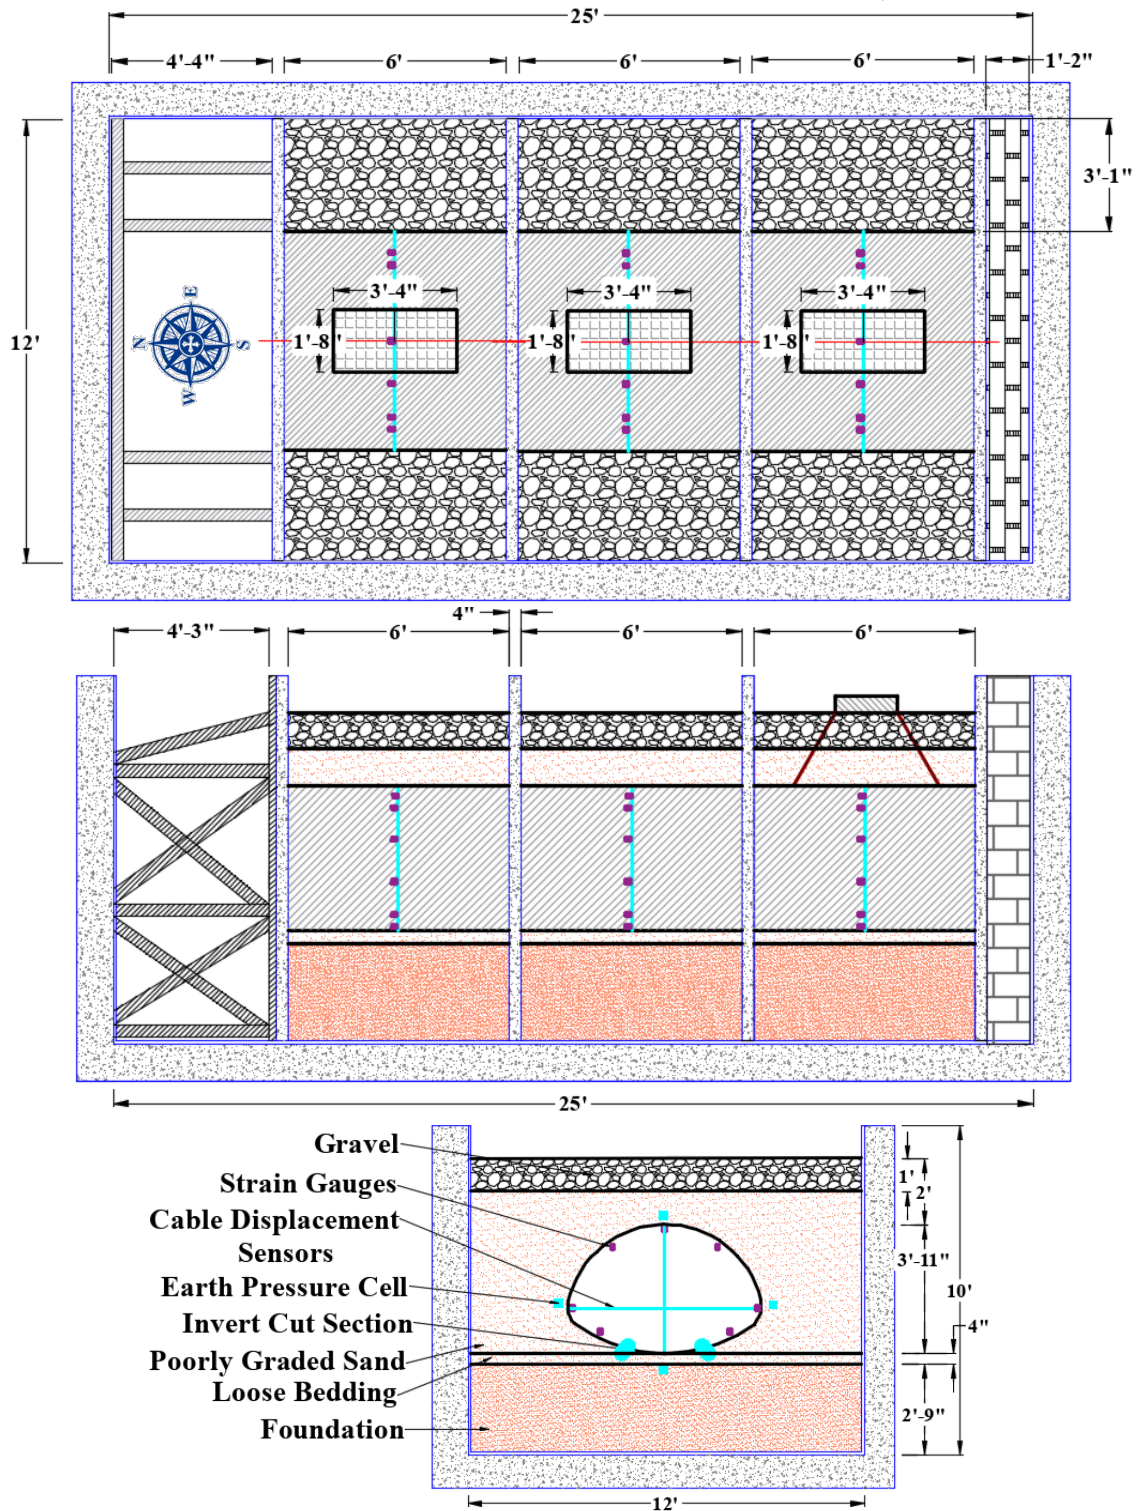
The pipe arch CMPs' burial configuration: (top) plan view, (middle) profile view of the aligned pipe arch CMPs in the soil-box, and (bottom) cross sectional view of the pipe arch CMP.
